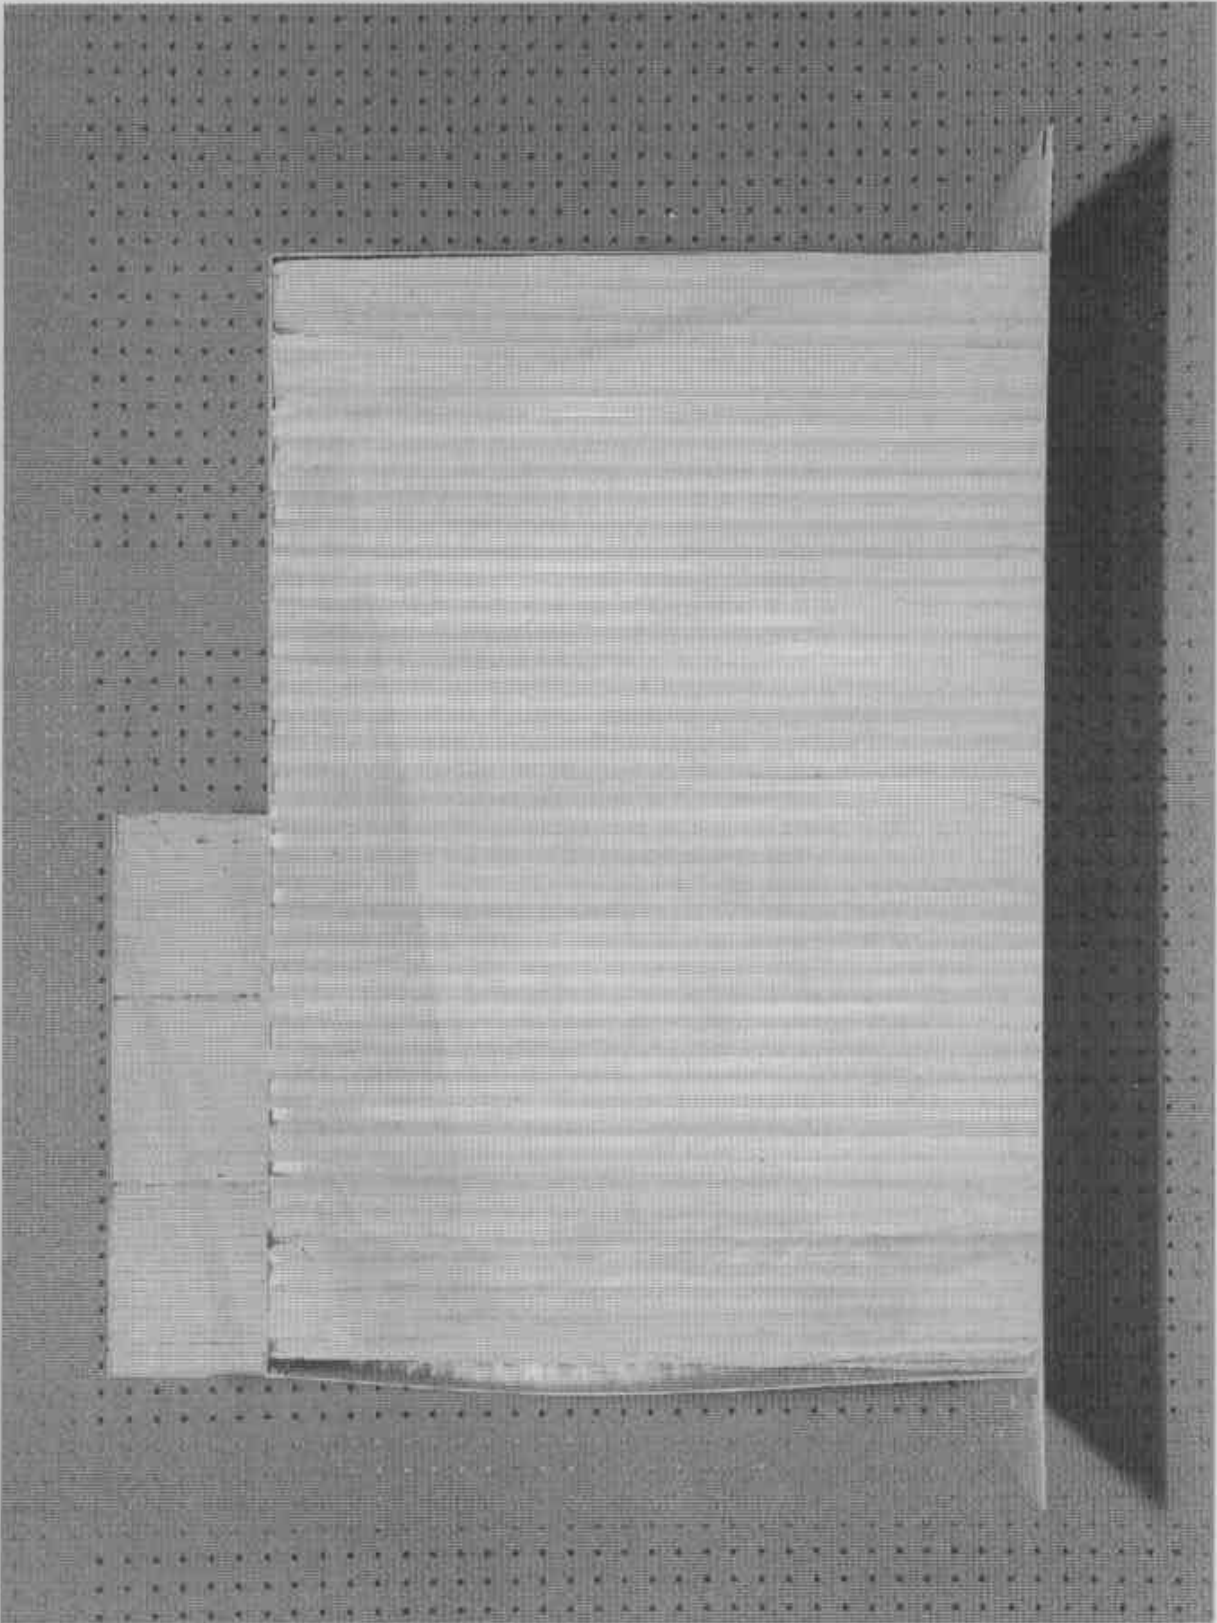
PRE-TEST BARRIER RIGHT SIDE VIEW
